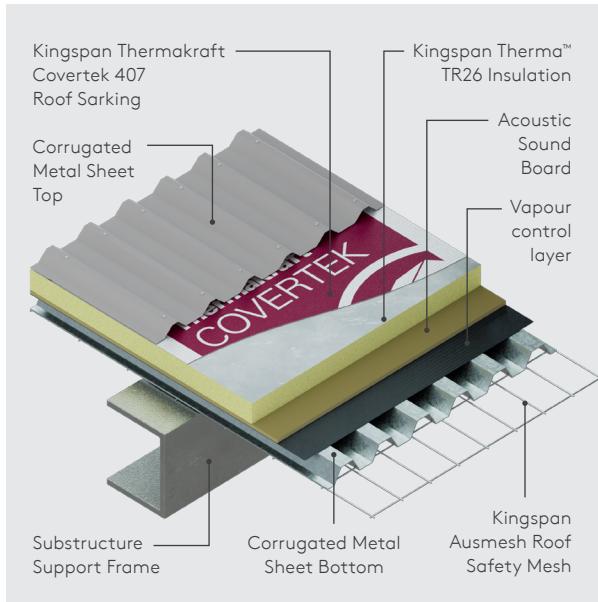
Kingspan Therma™ TR26 in a Built-up Metal Deck Roof with Acoustic Sound Board.
